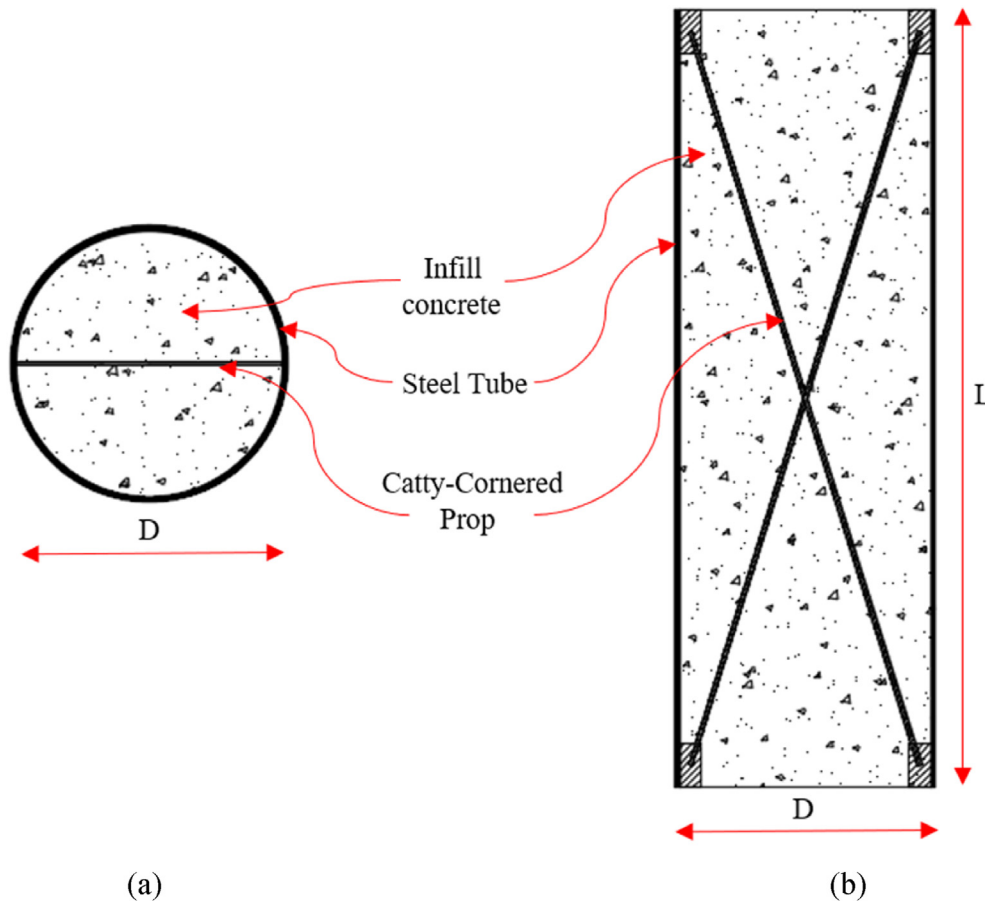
Layout of catty-cornered propped CFST, (a) Top view, (b) Elevation view.
